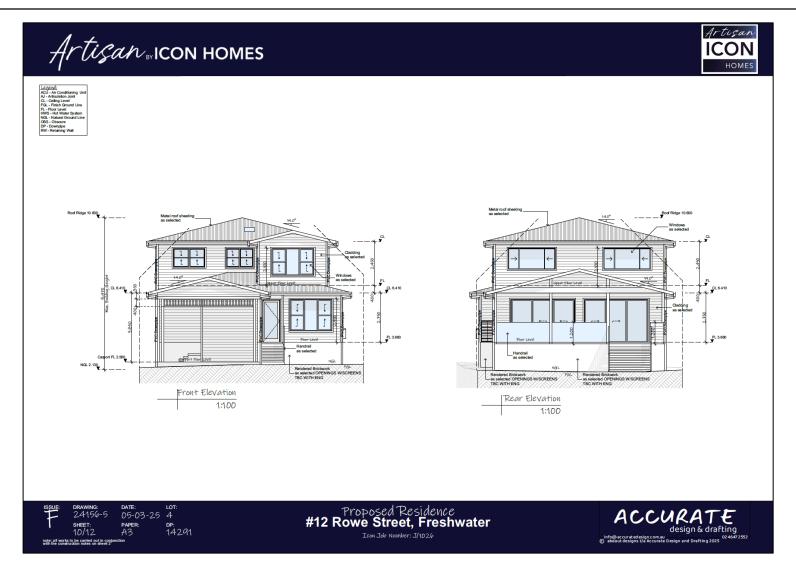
PROPOSED FROUNT AND REAR ELEVATIONS
